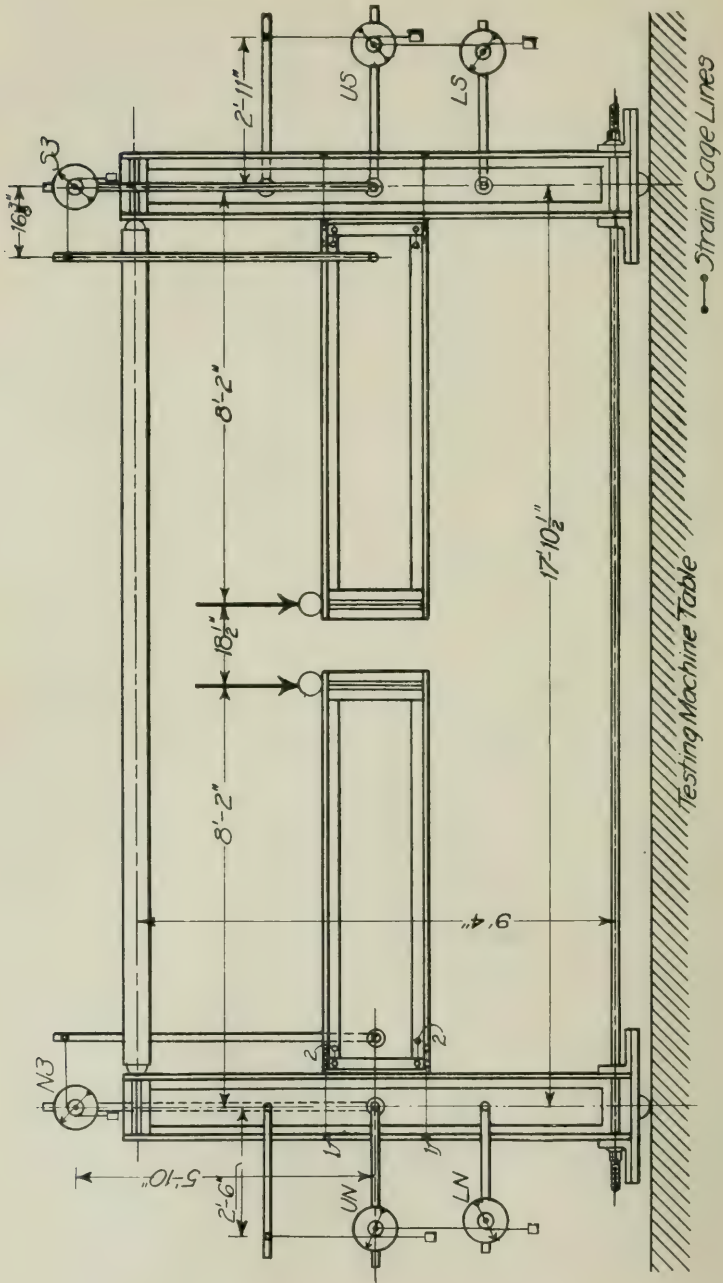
MEASUREMENTS OF ROTATION FOR TEST PIECES A5
